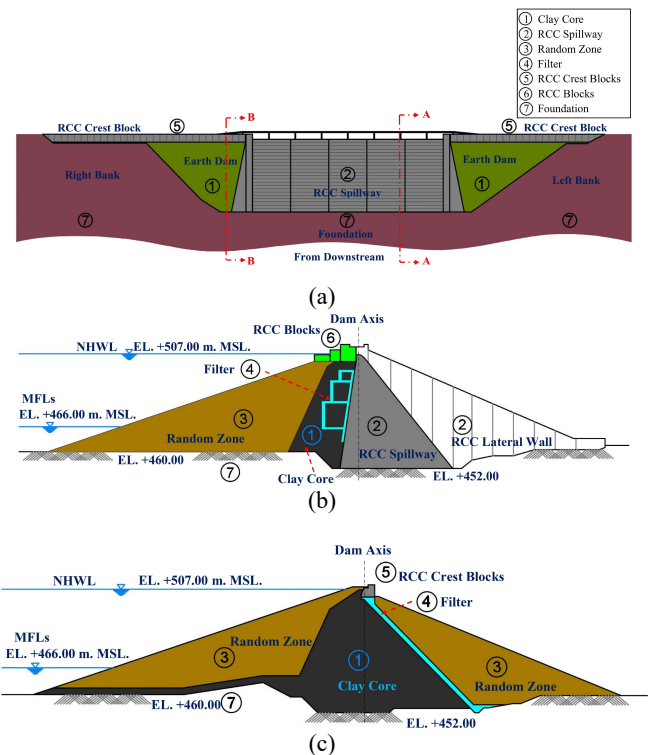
Longitudinal and Cross Section of Mae Suai Dam: (a) Longitudinal section; (b) Cross section A-A; (c) Cross section B-B (Soralump *et al.*, 2023)
